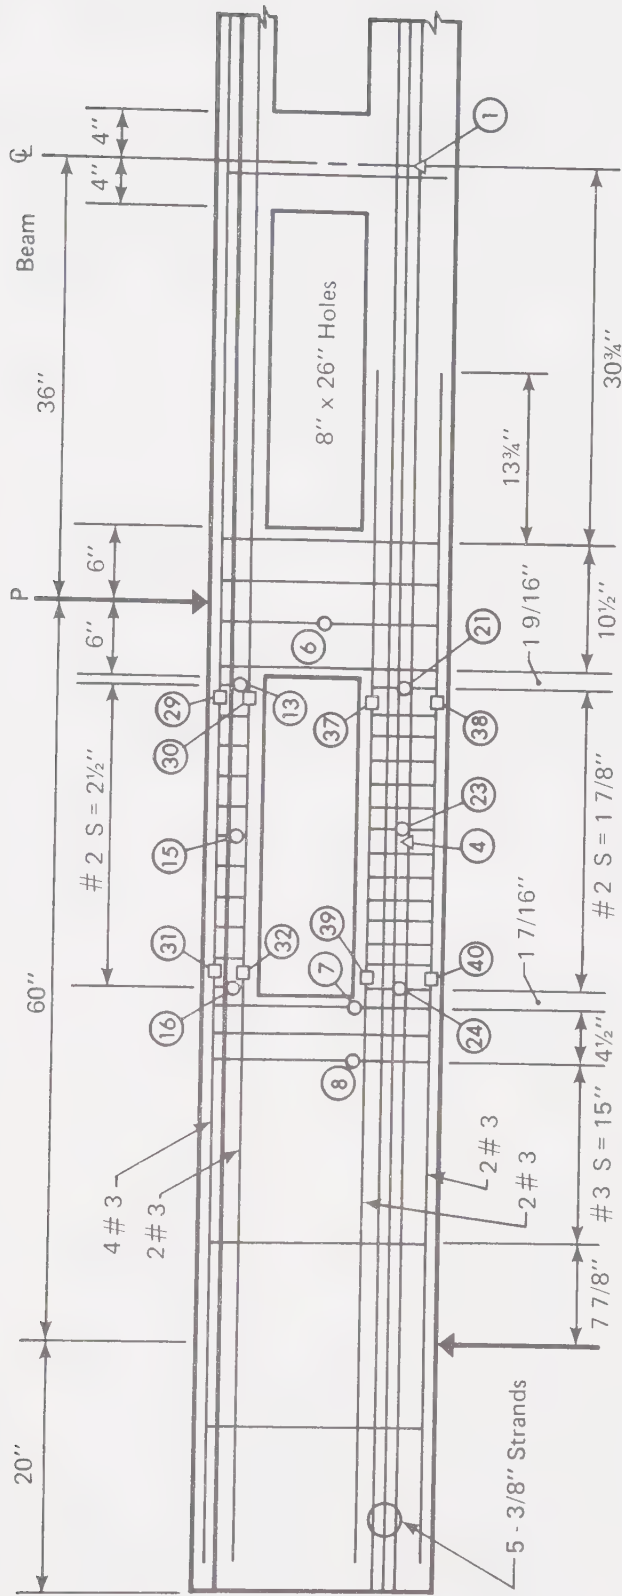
Reinforcement Details and Strain Gage Locations for Beam 20-26-5
